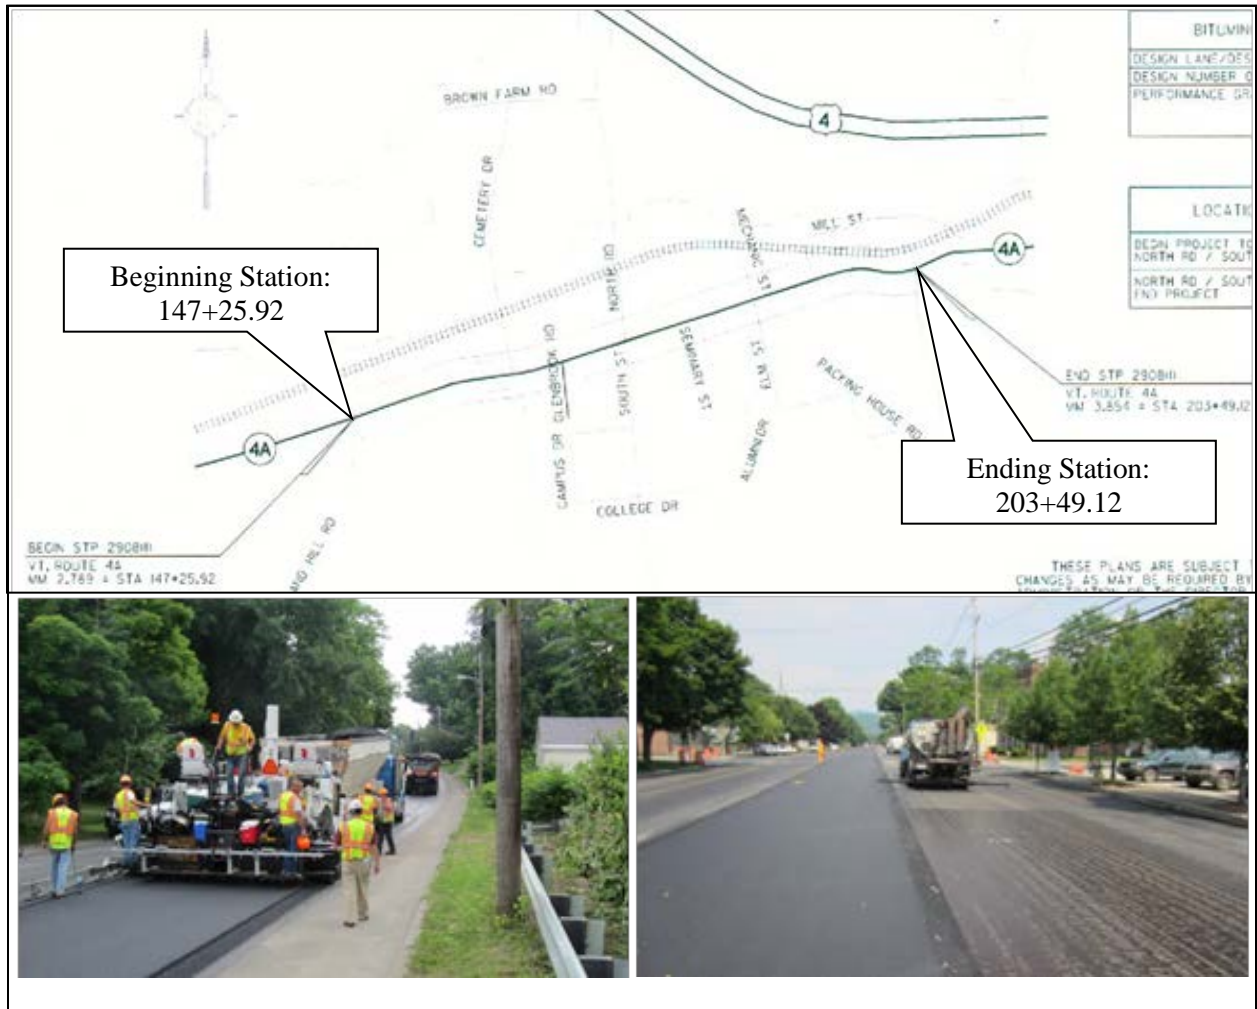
Project #2908—Limits and general view of U.S. 4A segment through Castleton.
